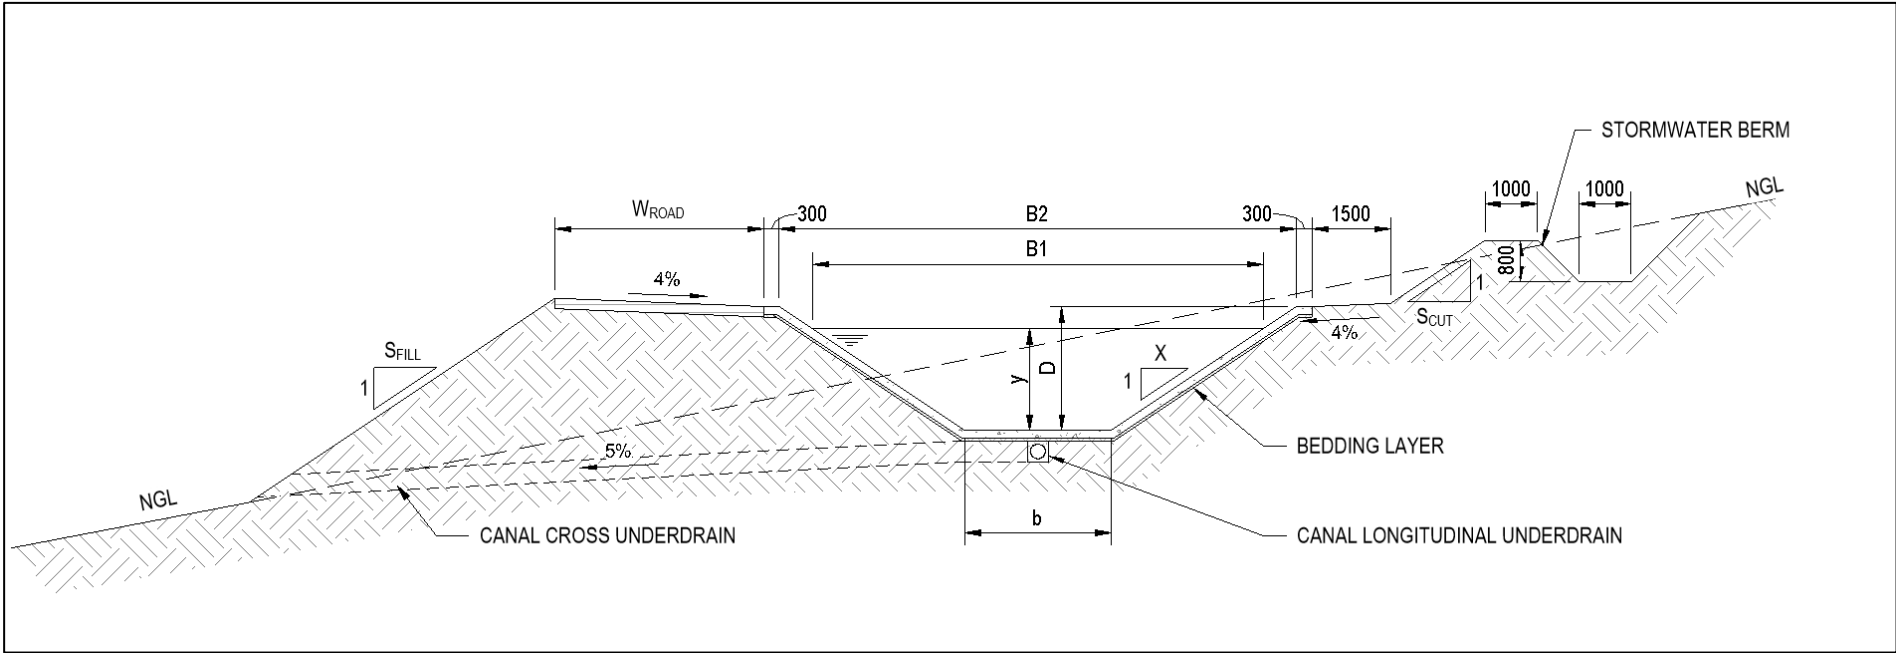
Trapezoidal canal cross-section (Types T1 and T2)
